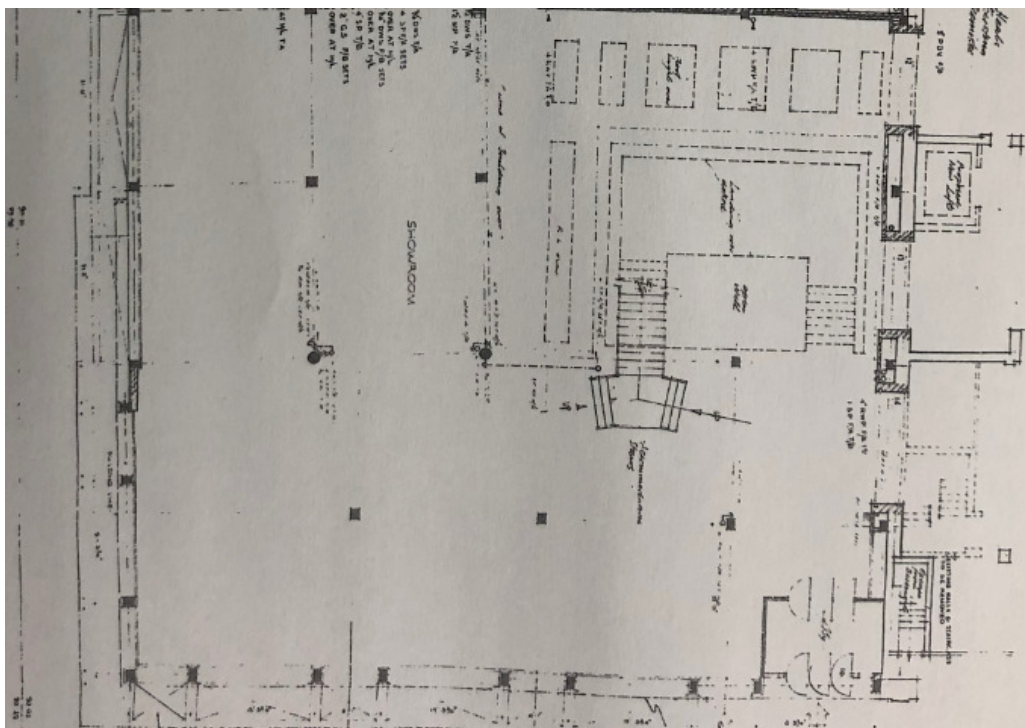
Extract of 1963 Proposed Ground Floor Plan
